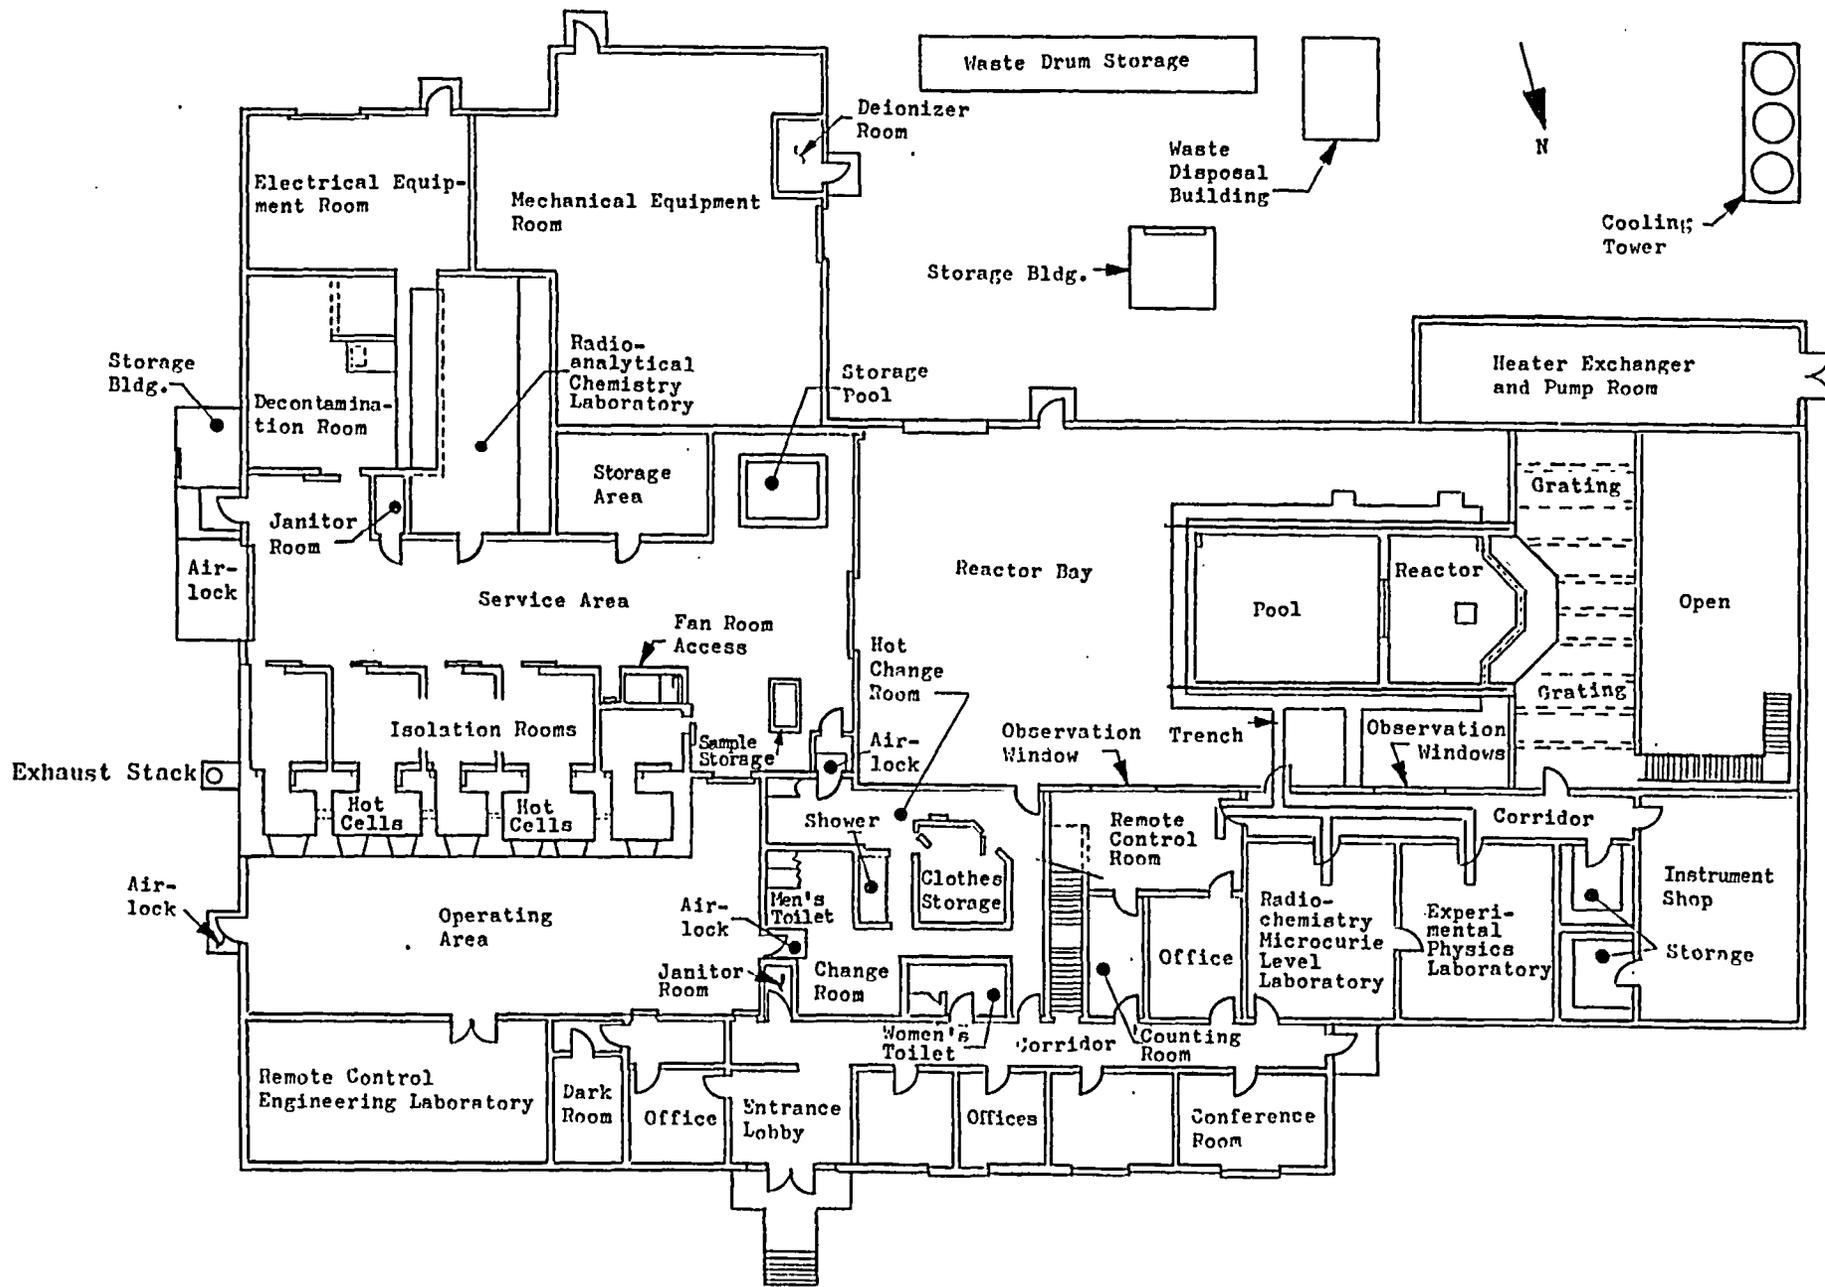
Main Floor Plan of Quehana Nuclear Facility, Showing Radioisotope Pilot Plant in Heavy Outline
